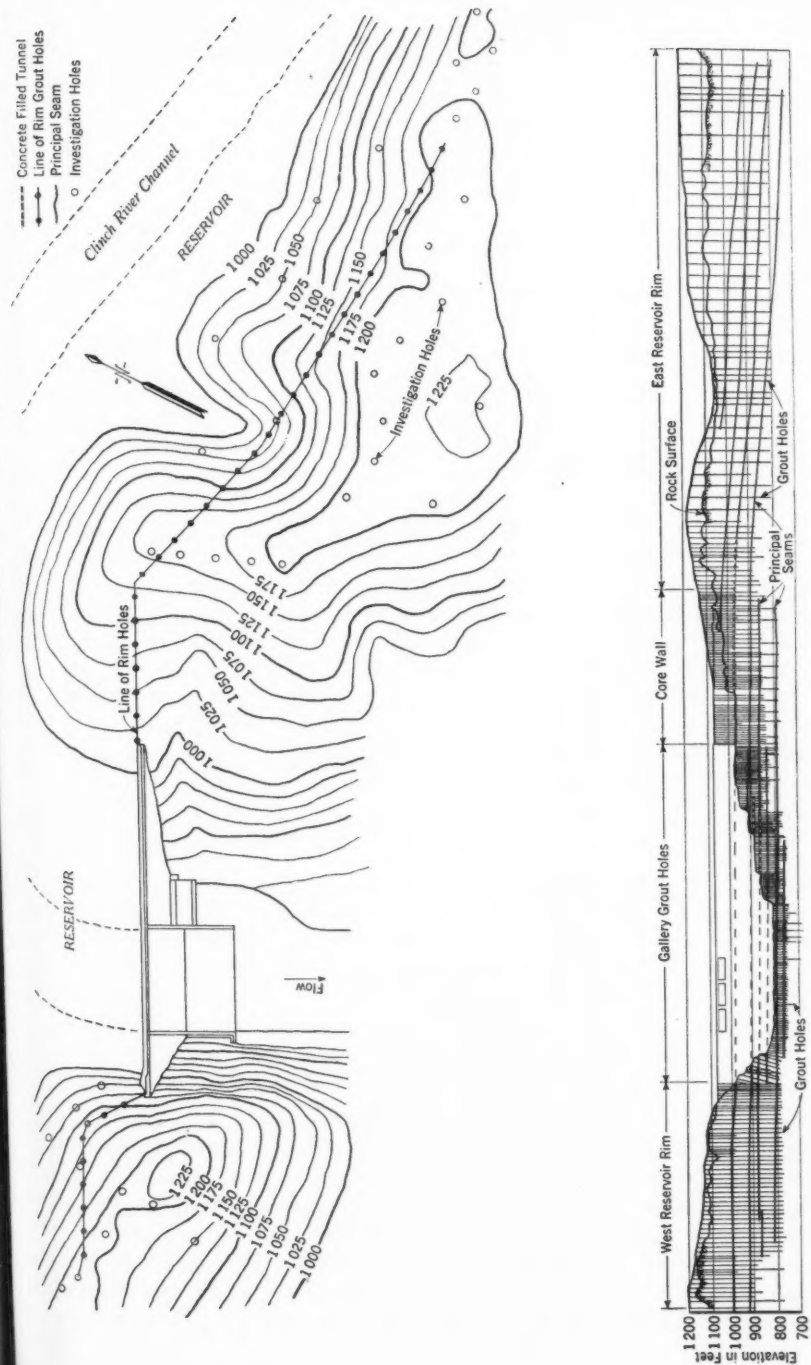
TOPOGRAPHY AND SECTION OF GROUTED AREAS
